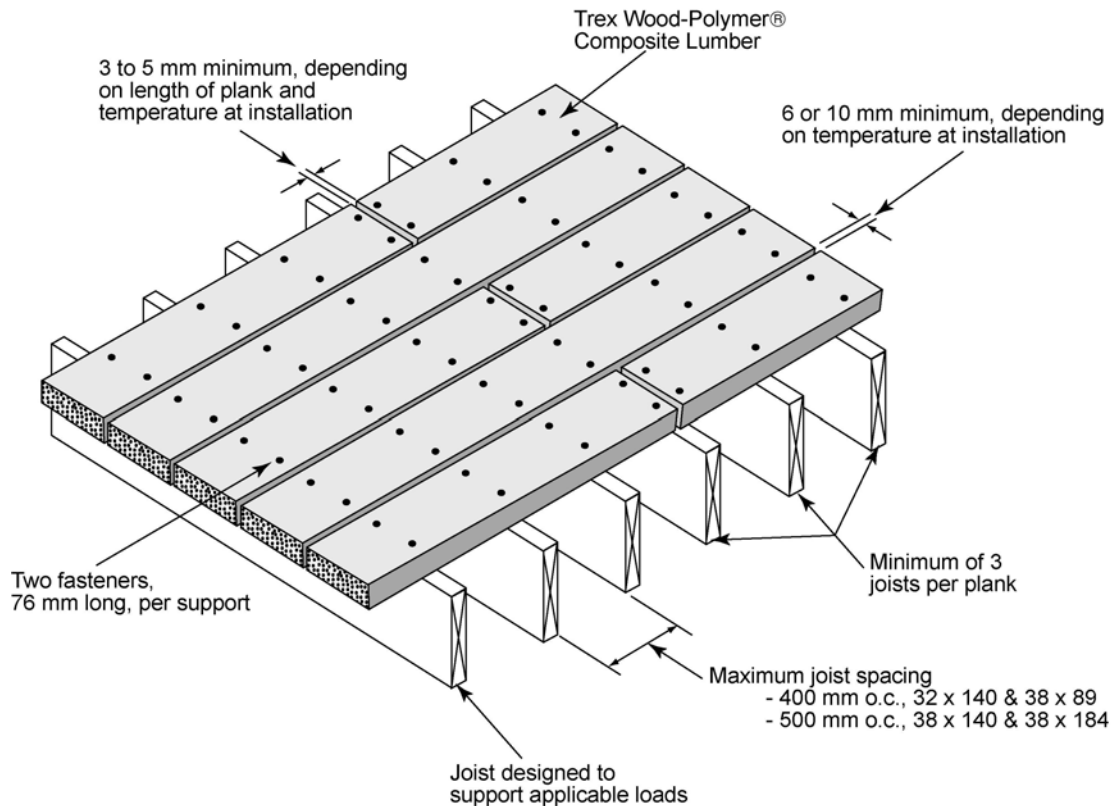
Installation of "Trex Wood-Polymer® Composite Lumber" Decking
